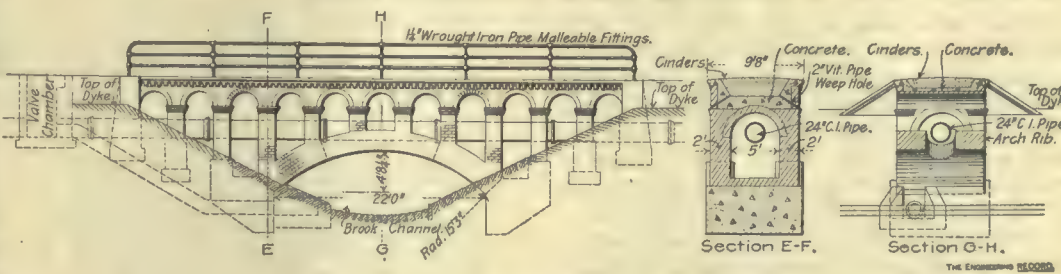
MASONRY ARCH BRIDGE CARRYING SEWER
